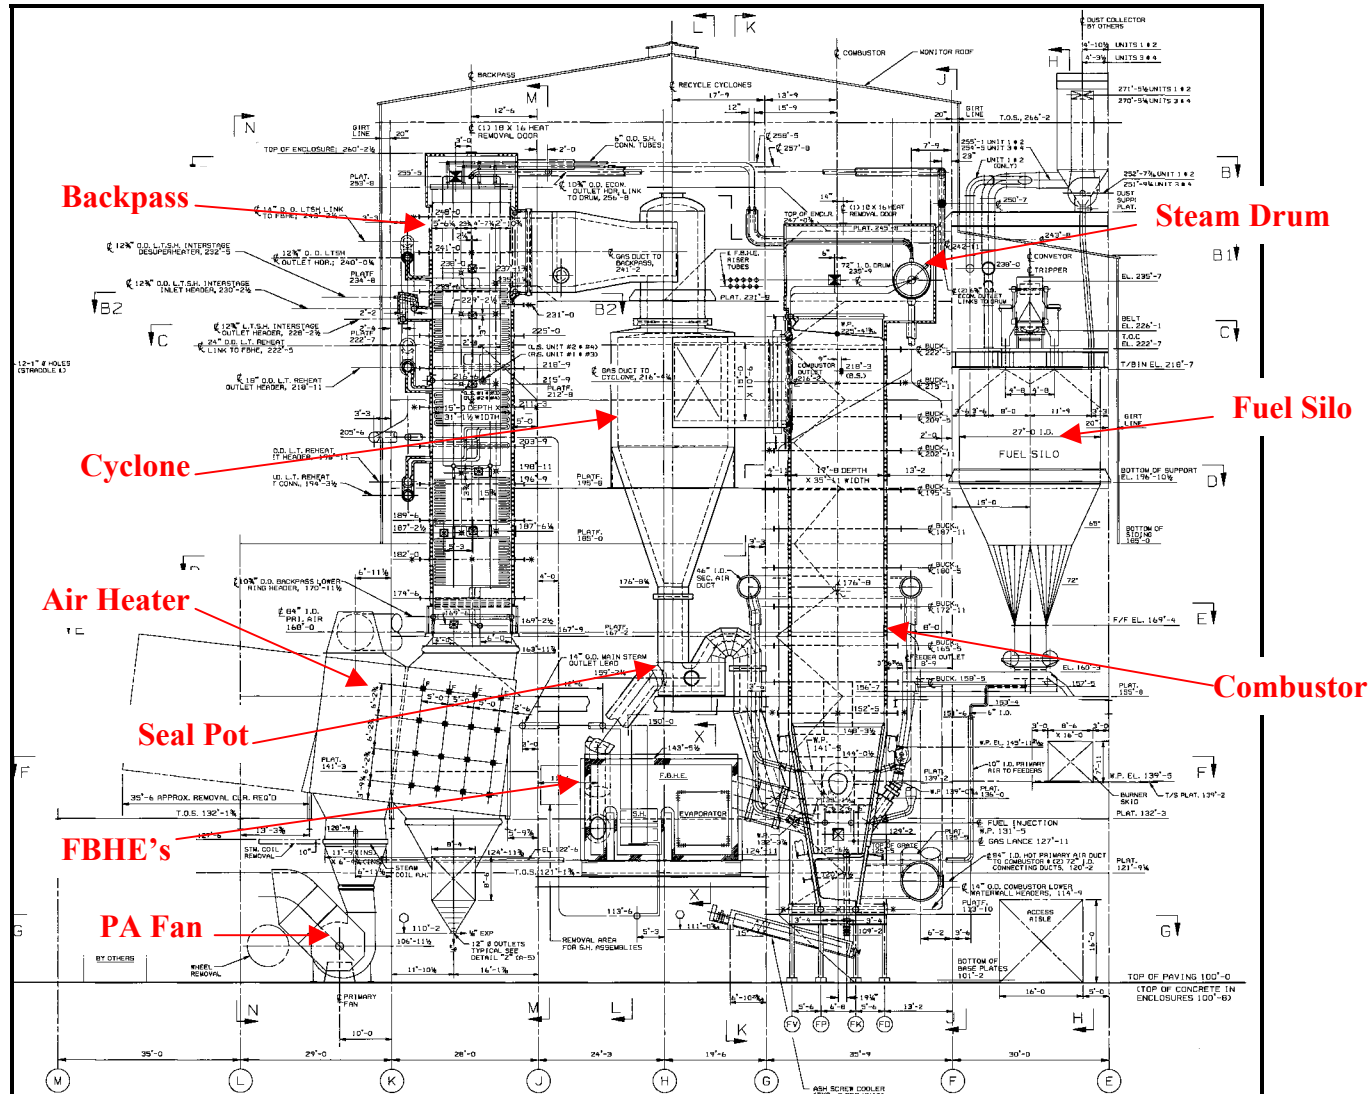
Study Unit (Existing CFB Steam Generator) Sectional Side Elevation Drawing
